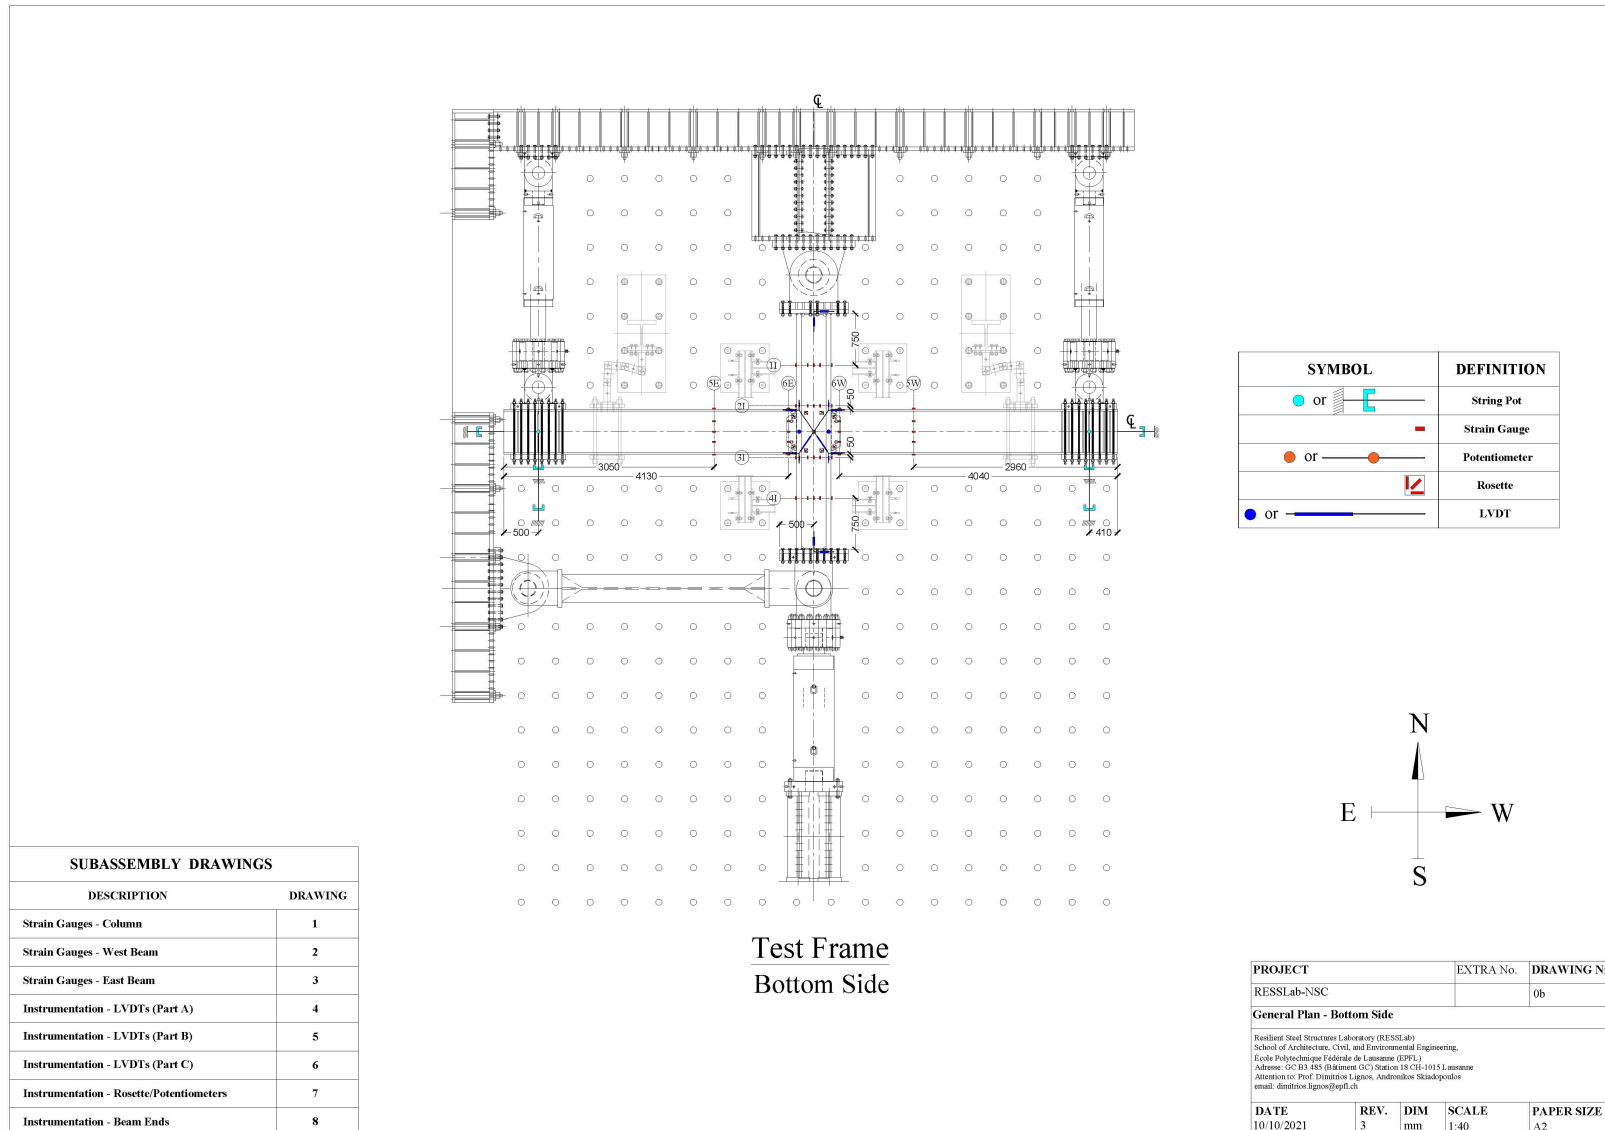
Instrumentation plan – bottom side general plan drawings.
